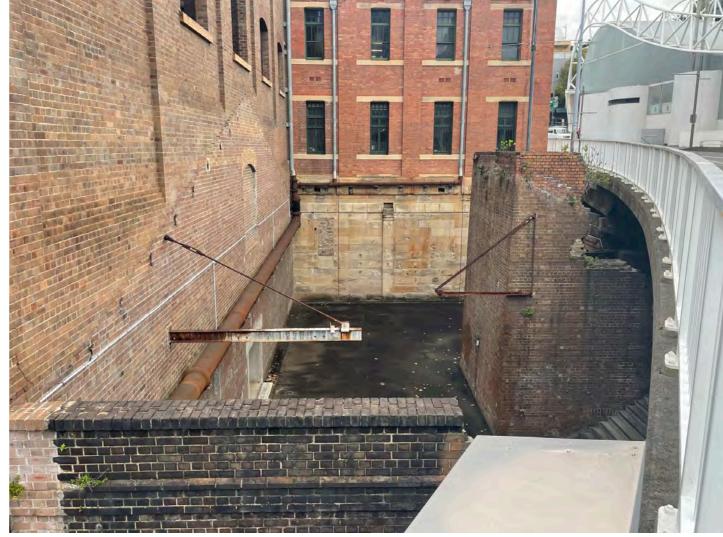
View of Pump House remains from William Henry Street bridge (Source: Powerhouse 2022)
